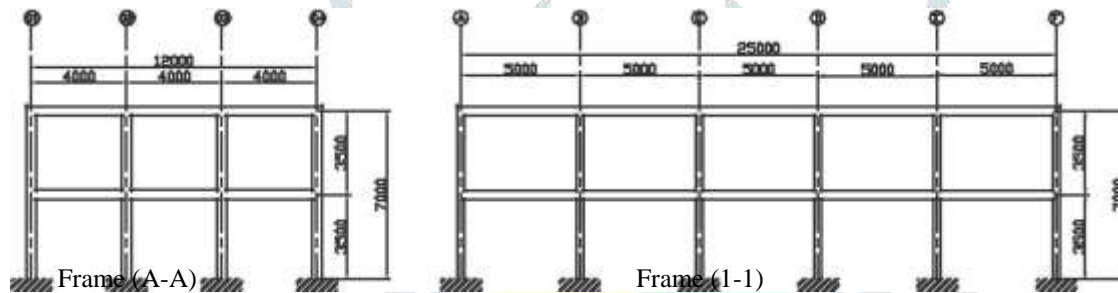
Frame (A-A) and (1-1) Of two-story regular R.C. building (all dimension in mm)
